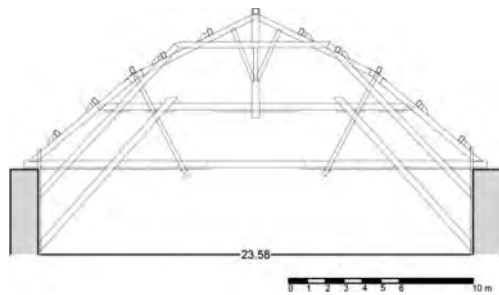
Cross section of the roof of the Grand Théâtre in Bordeaux (Survey plan: author).
